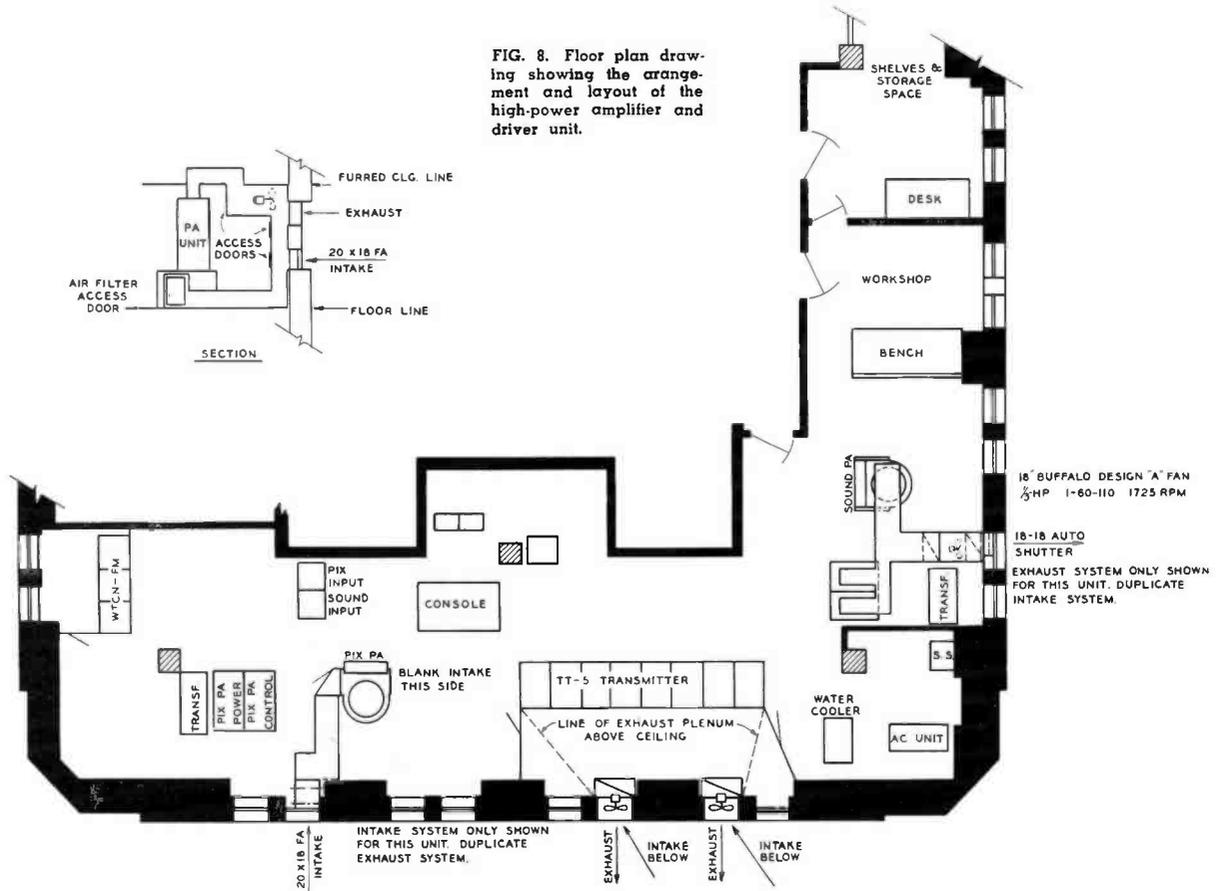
Floor plan drawing showing the arrangement and layout of the high-power amplifier and driver unit.
